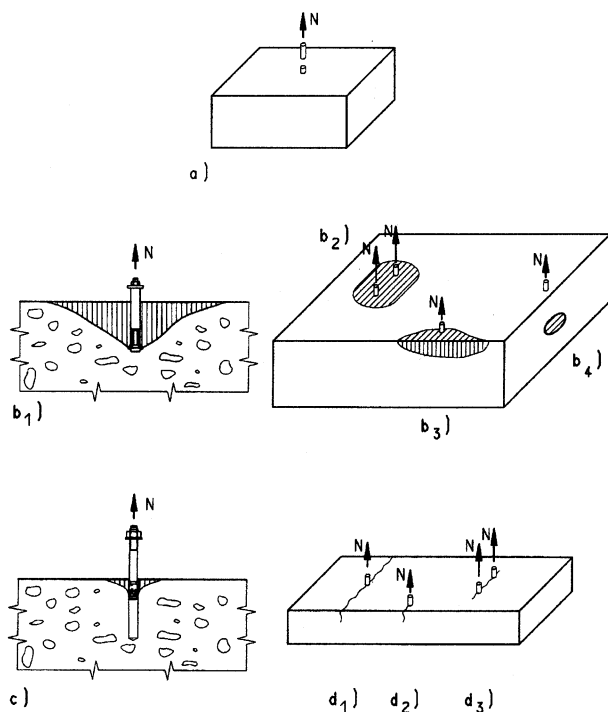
Failure modes for fastenings under tensile loading: (a) steel failure; (b) concrete breakout; (c) pullout; (d) concrete splitting
